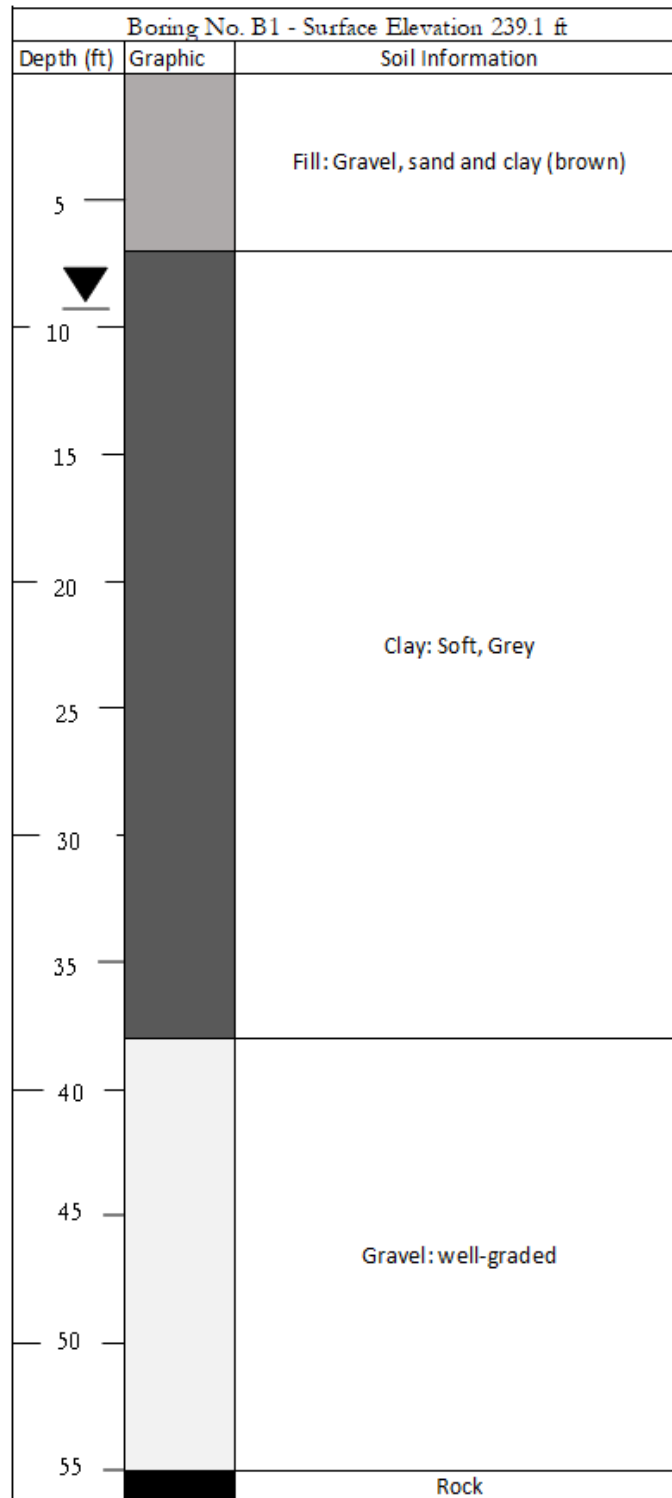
Boring B-1 (note surface elevation and groundwater table elevation(prior to pumping))
